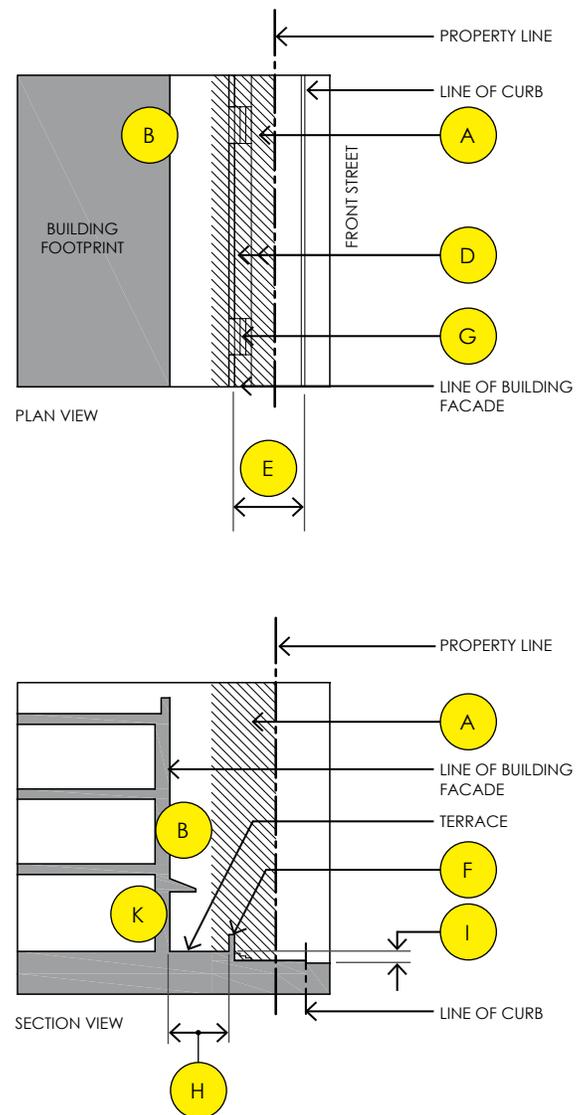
FLEX BUILDING WITH TERRACE
